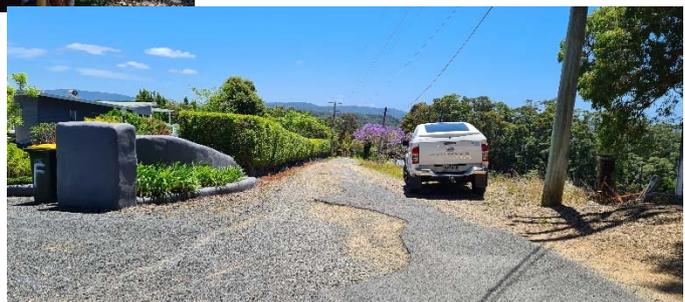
(left). Looking westward along Gaudrons Rd, access point to Dwelling A to the right. Note concrete tank shown on Plate 3
